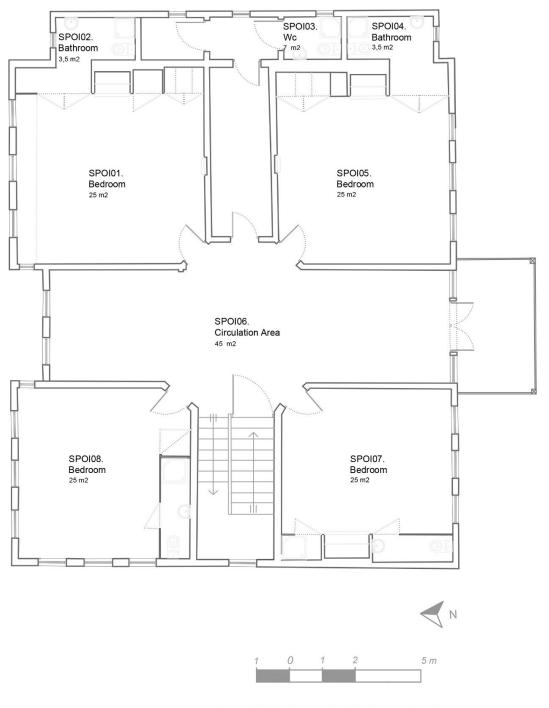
Post-intervention first floor plan of Hacı Rıfatlar house (Author, 2023)
